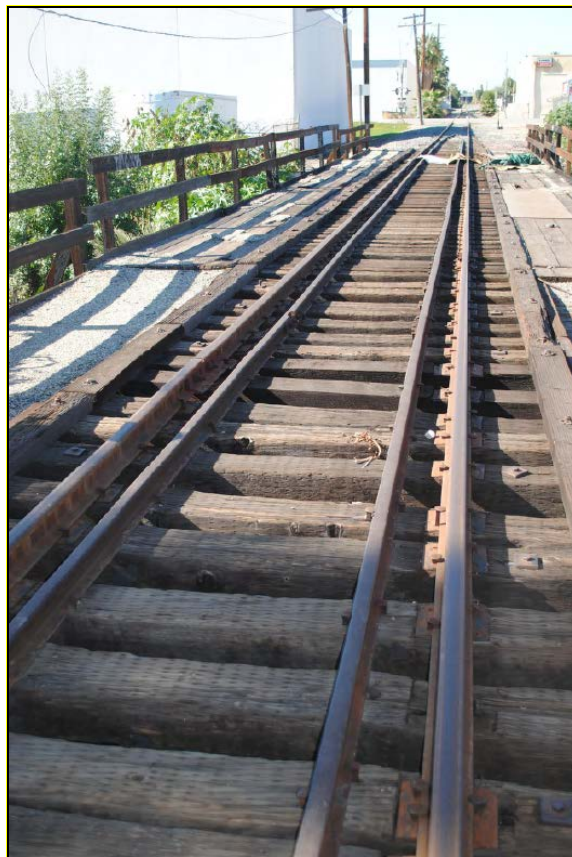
shows Warm Creek, looking downstream from Bridge 1.1. Figure 2 shows Warm Creek looking upstream from Bridge 1.1. Figure 3 shows the Bridge 1.1 deck.
